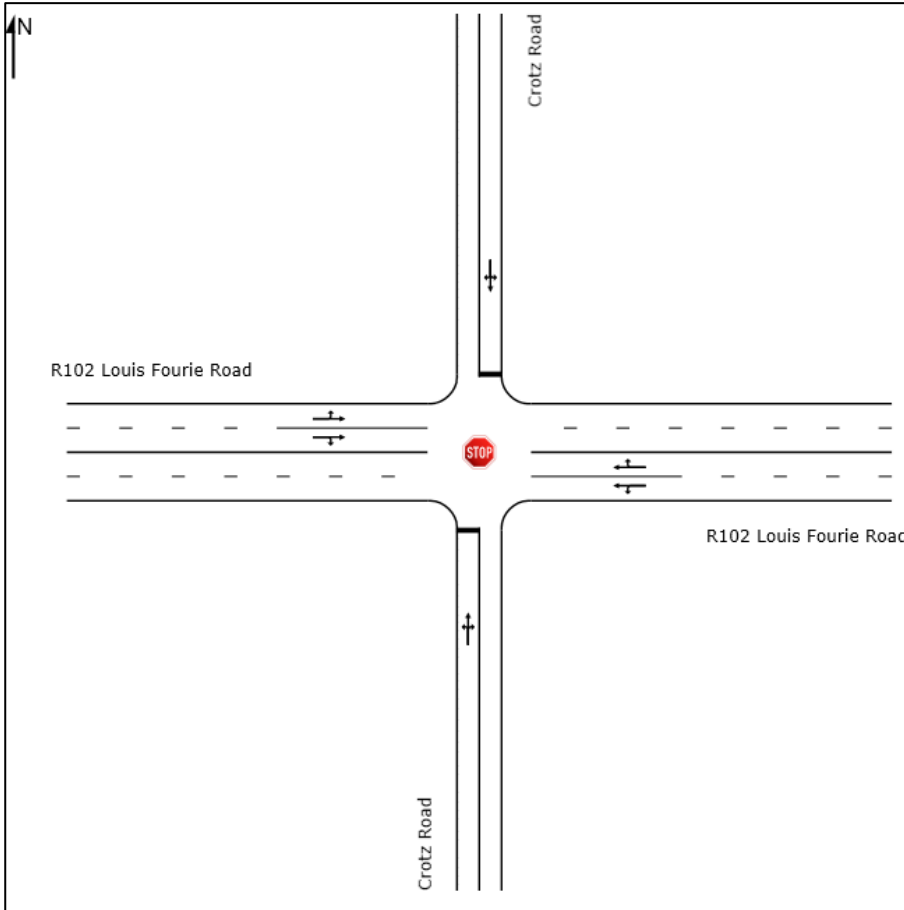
Existing Intersection Layout: R102 Louis Fourie Road and Crotz Road
